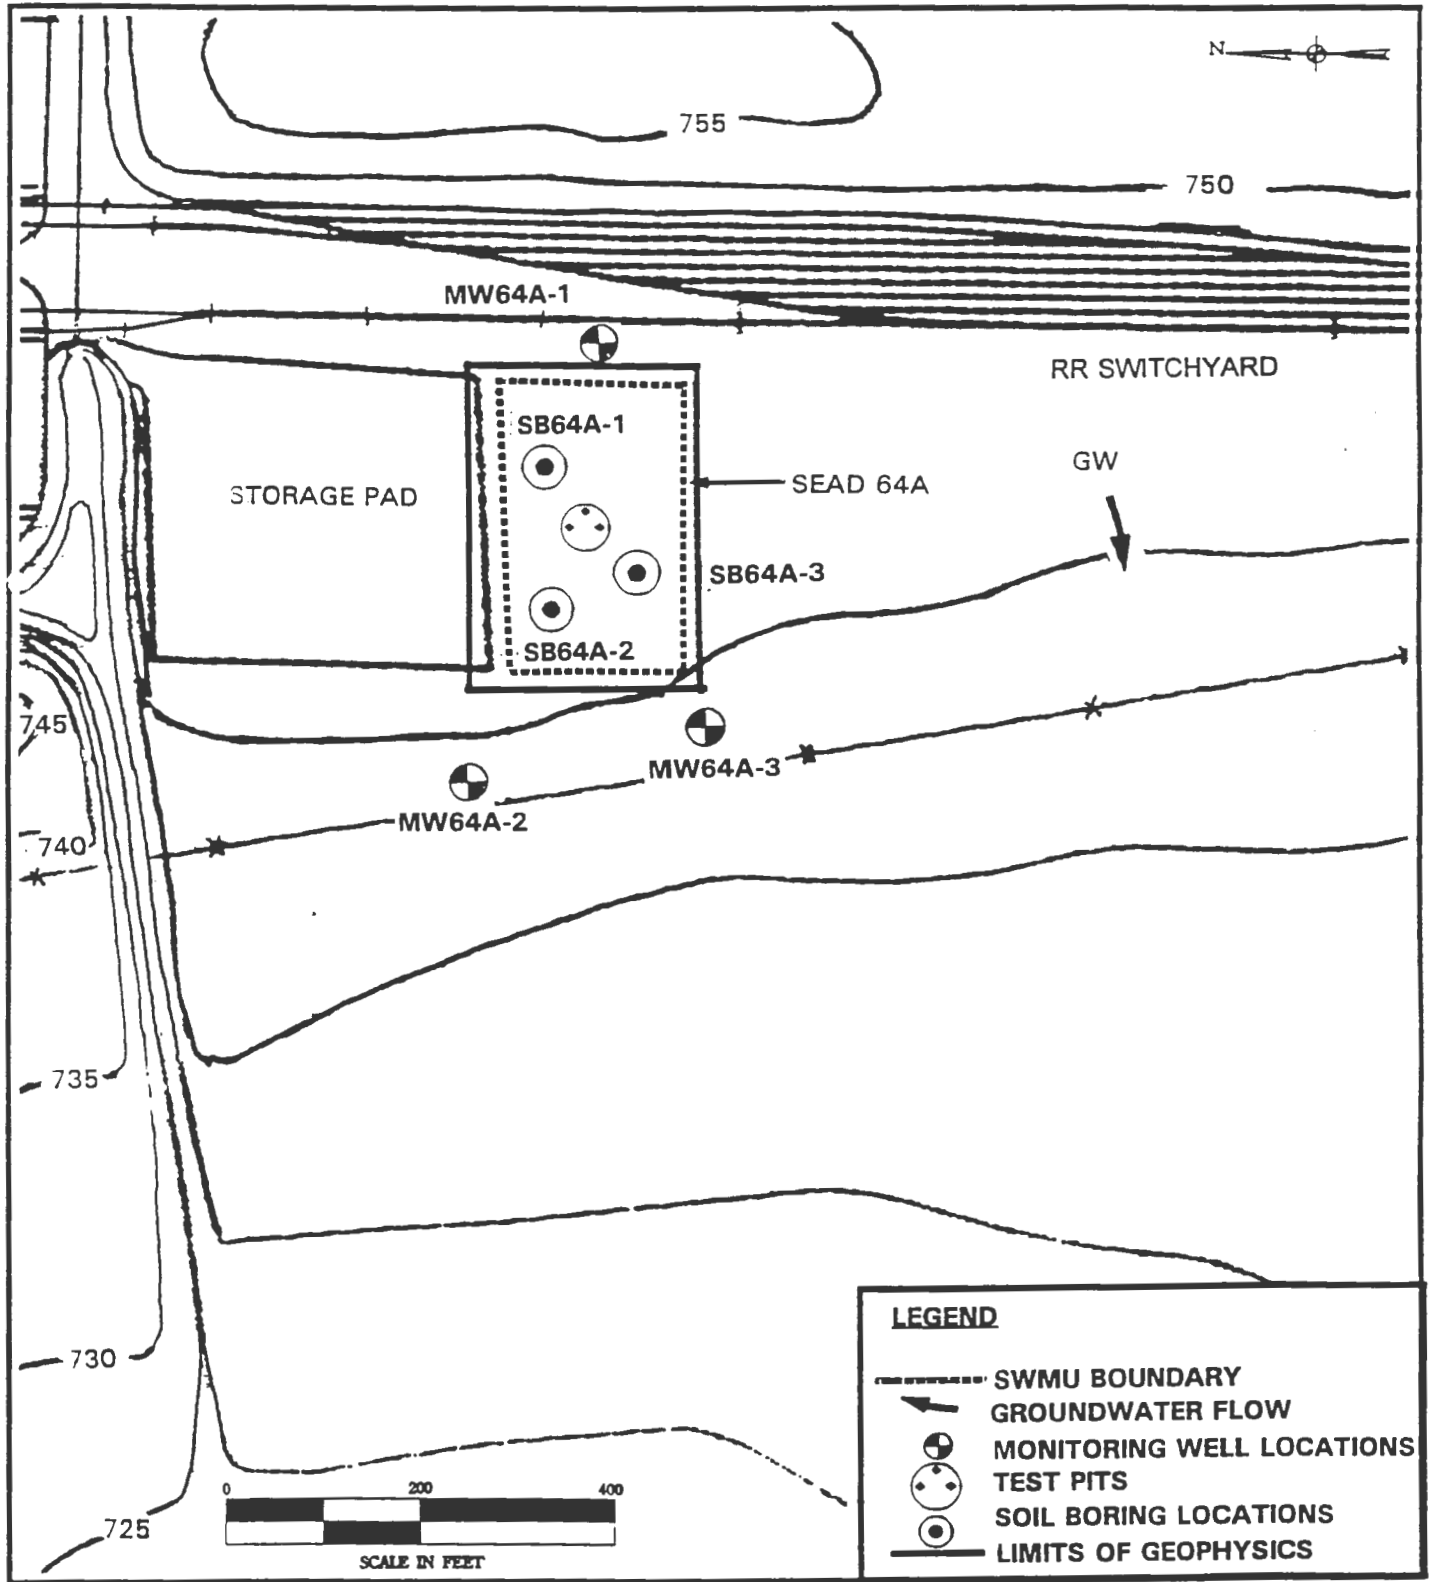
A SITE PLAN FOR SEAD SWMU 64A: GARBAGE DISPOSAL AREA
